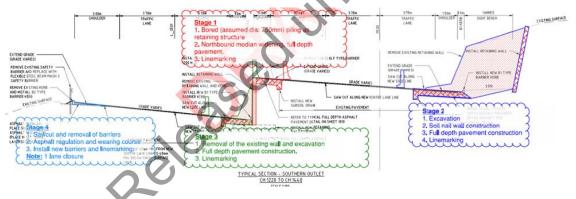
Typical section – Southern Outlet Ch. 1220 to Ch. 1440
